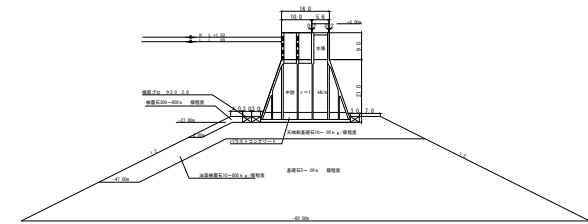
Standard cross section in the deep water section of the North Breakwater
